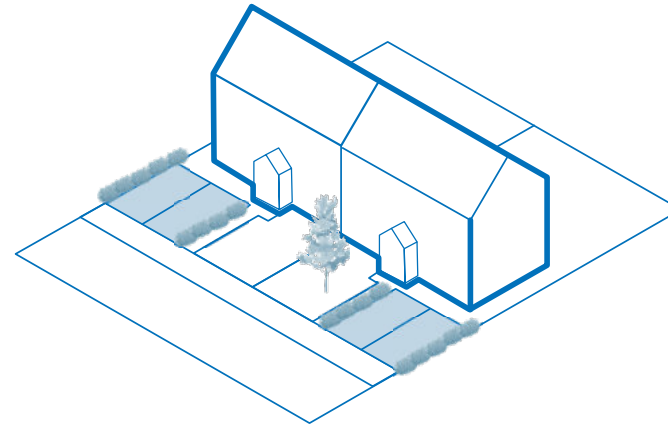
Illustrative diagram showing an indicative layout of on-plot front parking
